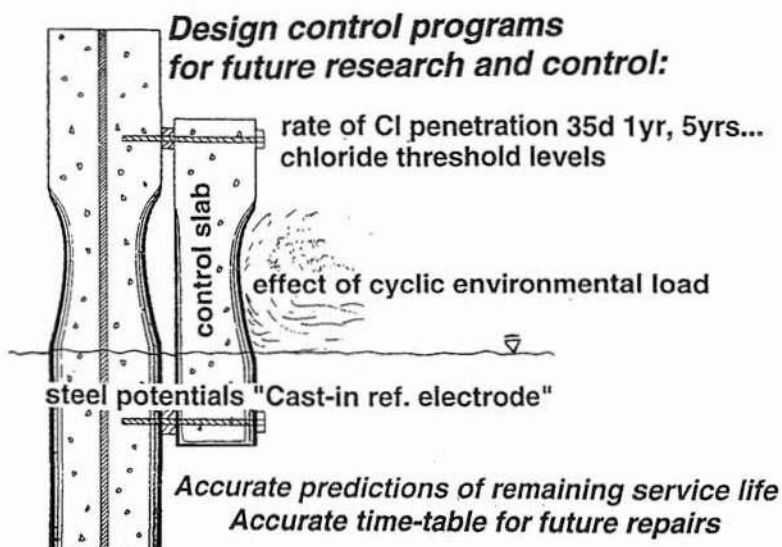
Control slabs placed parallel to concrete structures, for field monitoring of concrete.
